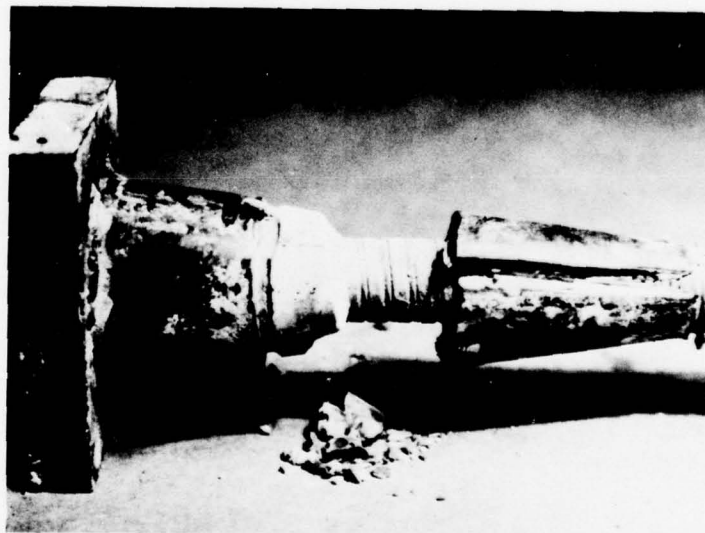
Grout in the landward end housing of beam 9 leaving cavity between housing and conduit
